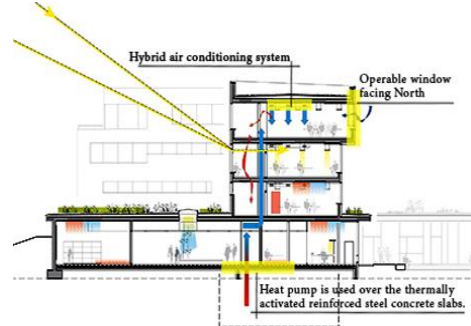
The whole ventilation technique use in Ergolding secondary school. (Architekten, 2014)
